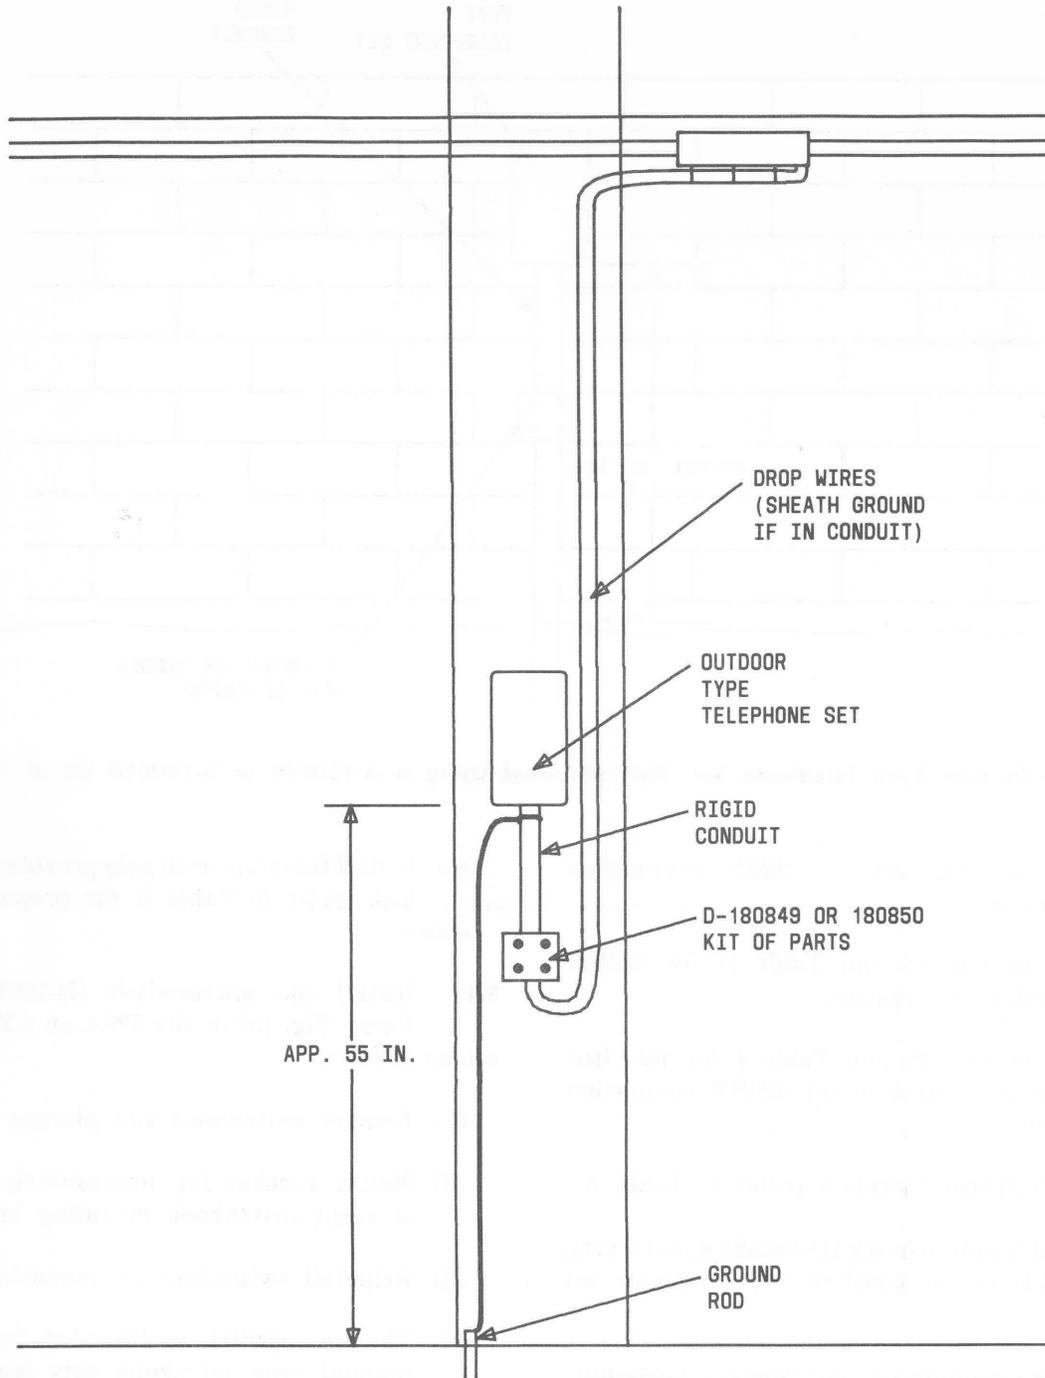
Outdoor Type Telephone Set, Pole Mounted Using a D-180849 or D-180850 Kit of Parts
